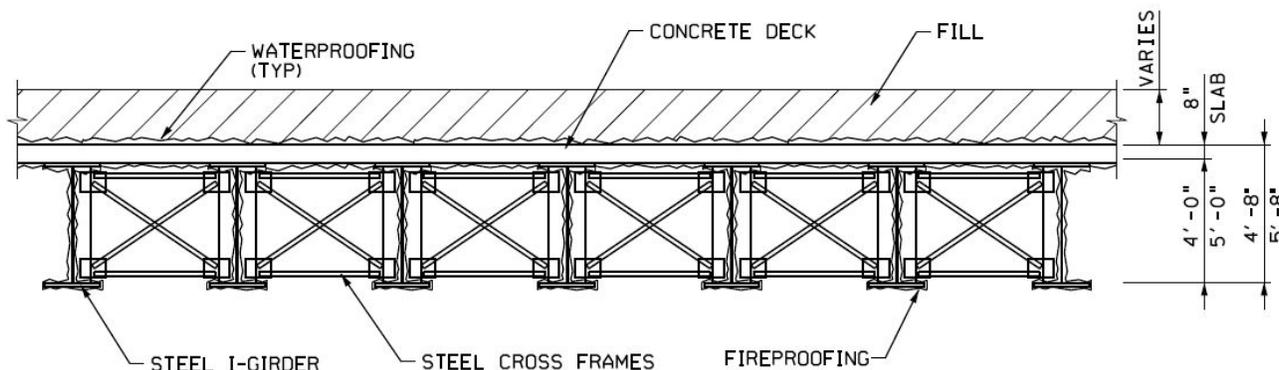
Superstructure Option S3, Steel I-Girders with Concrete Deck (Not To Scale)
